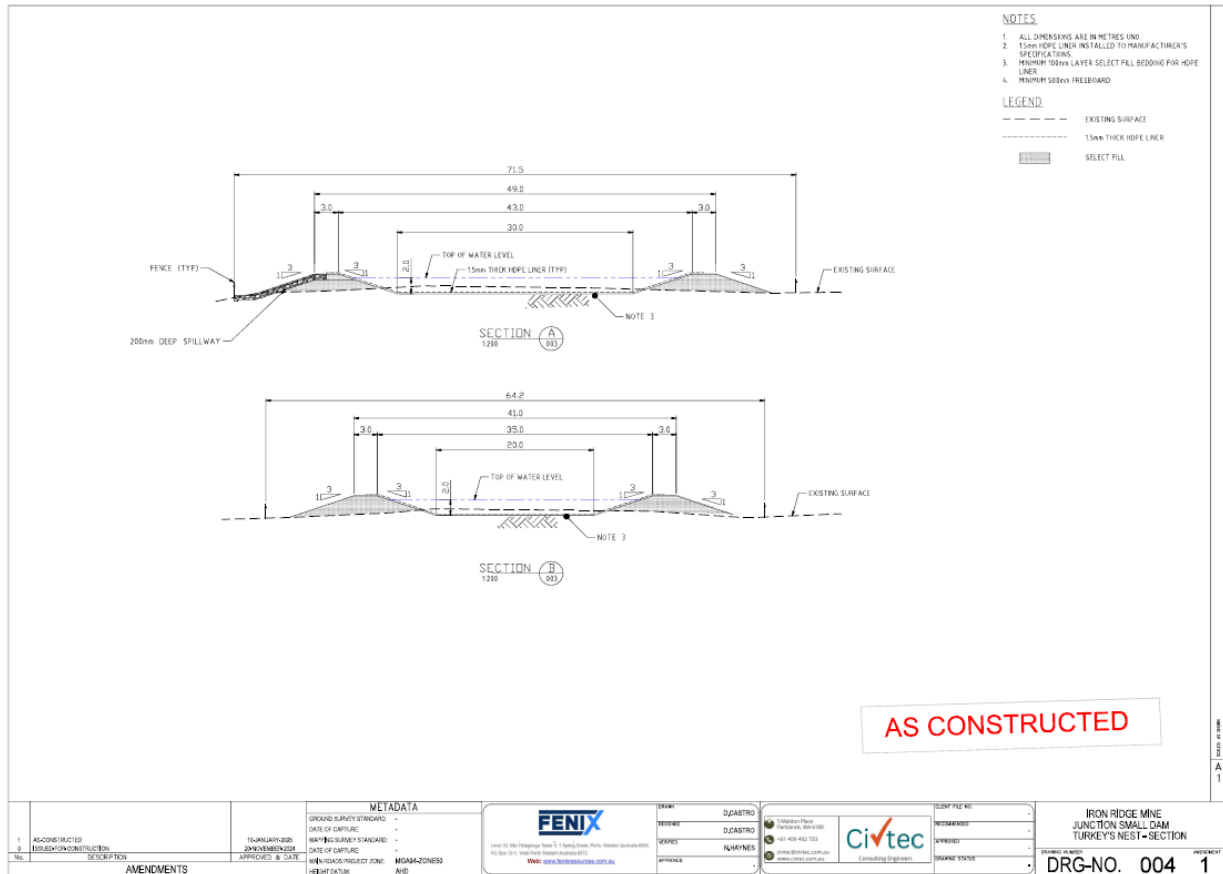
Plan of the new water storage dam (as constructed) (FBL, 2025)
